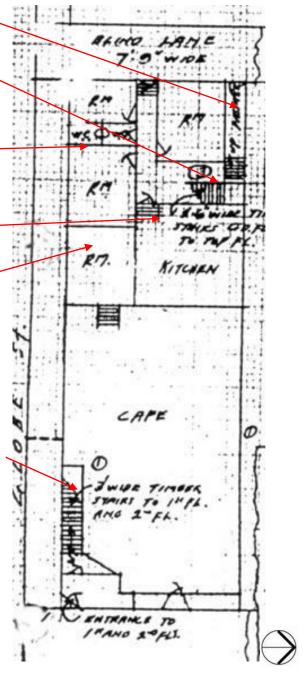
143–143a George Street, Ground Floor Sketch Plan, 1943.
